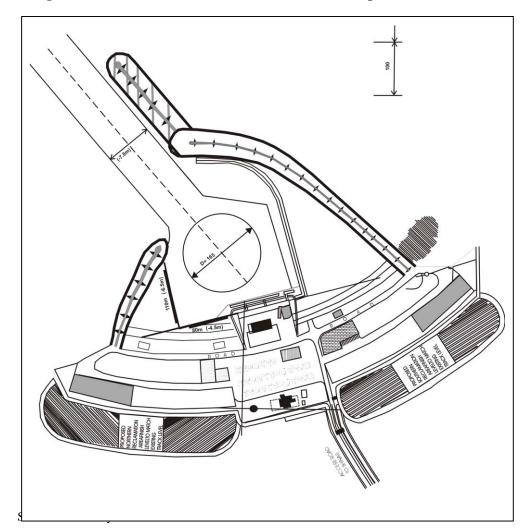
Alternative B of Shinas Port Development Plan for 2025
